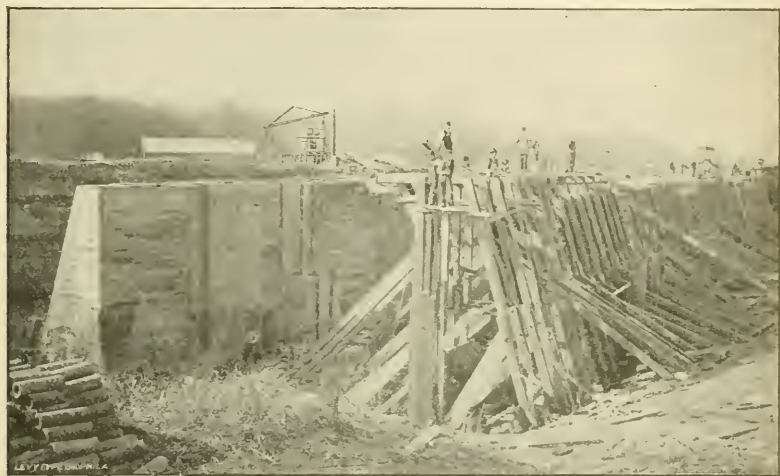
CONSTRUCTING NORTH WALL OF LOCK 37 (Nov. 10, 1893).
